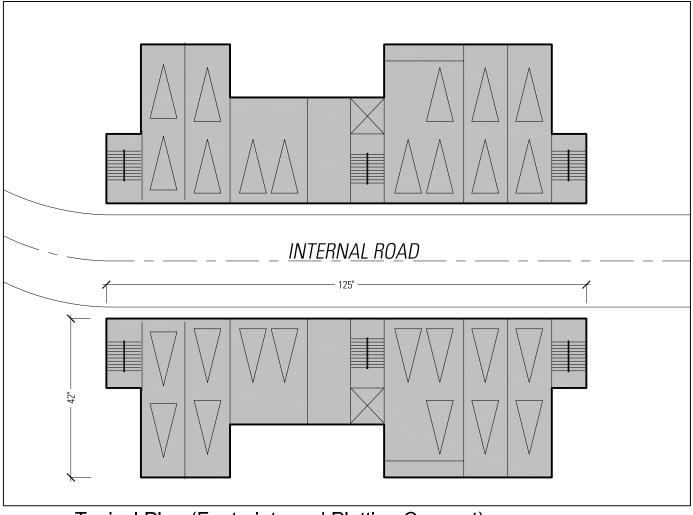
, "Resort Flats Concept Plans and Elevations," illustrates the typical floor plans for the Resort Flats. Usable living areas may range from approximately 1,900 to 2,100 square feet in size. The elevations in Exhibit 6-8 illustrate the architectural character of these buildings both in form and style, which relates directly to the adjacent Resort Inn to the east.
